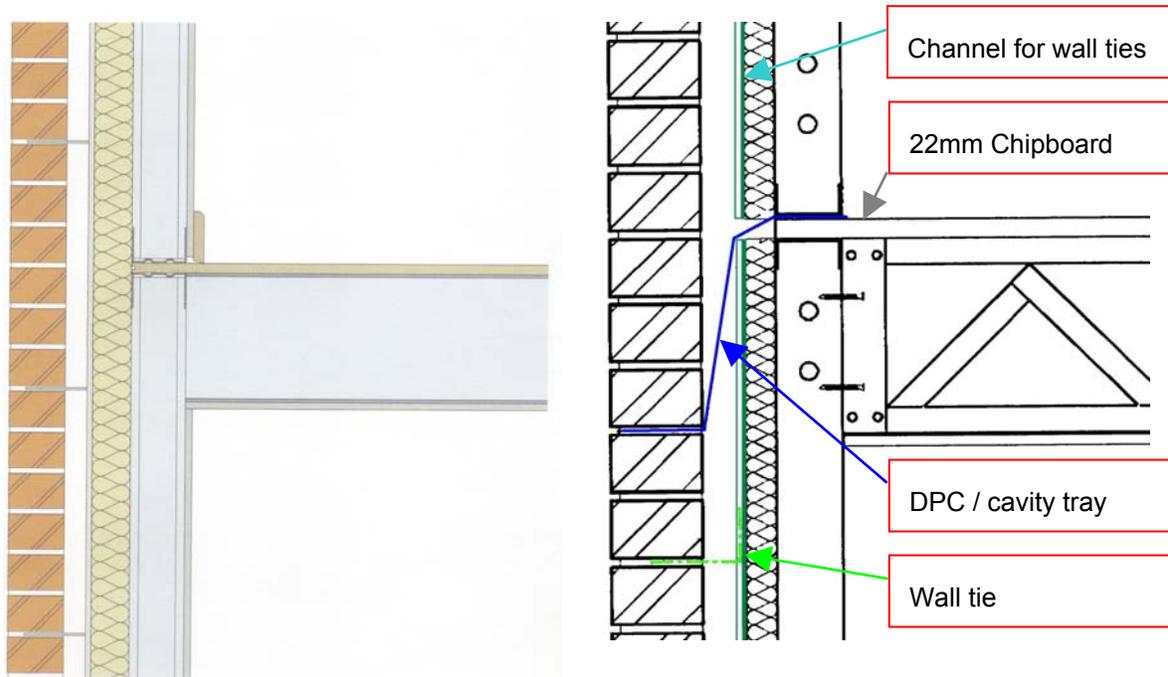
Robust Detail 7.13 and typical design detail of an intermediate floor for lightweight steel frame construction.
